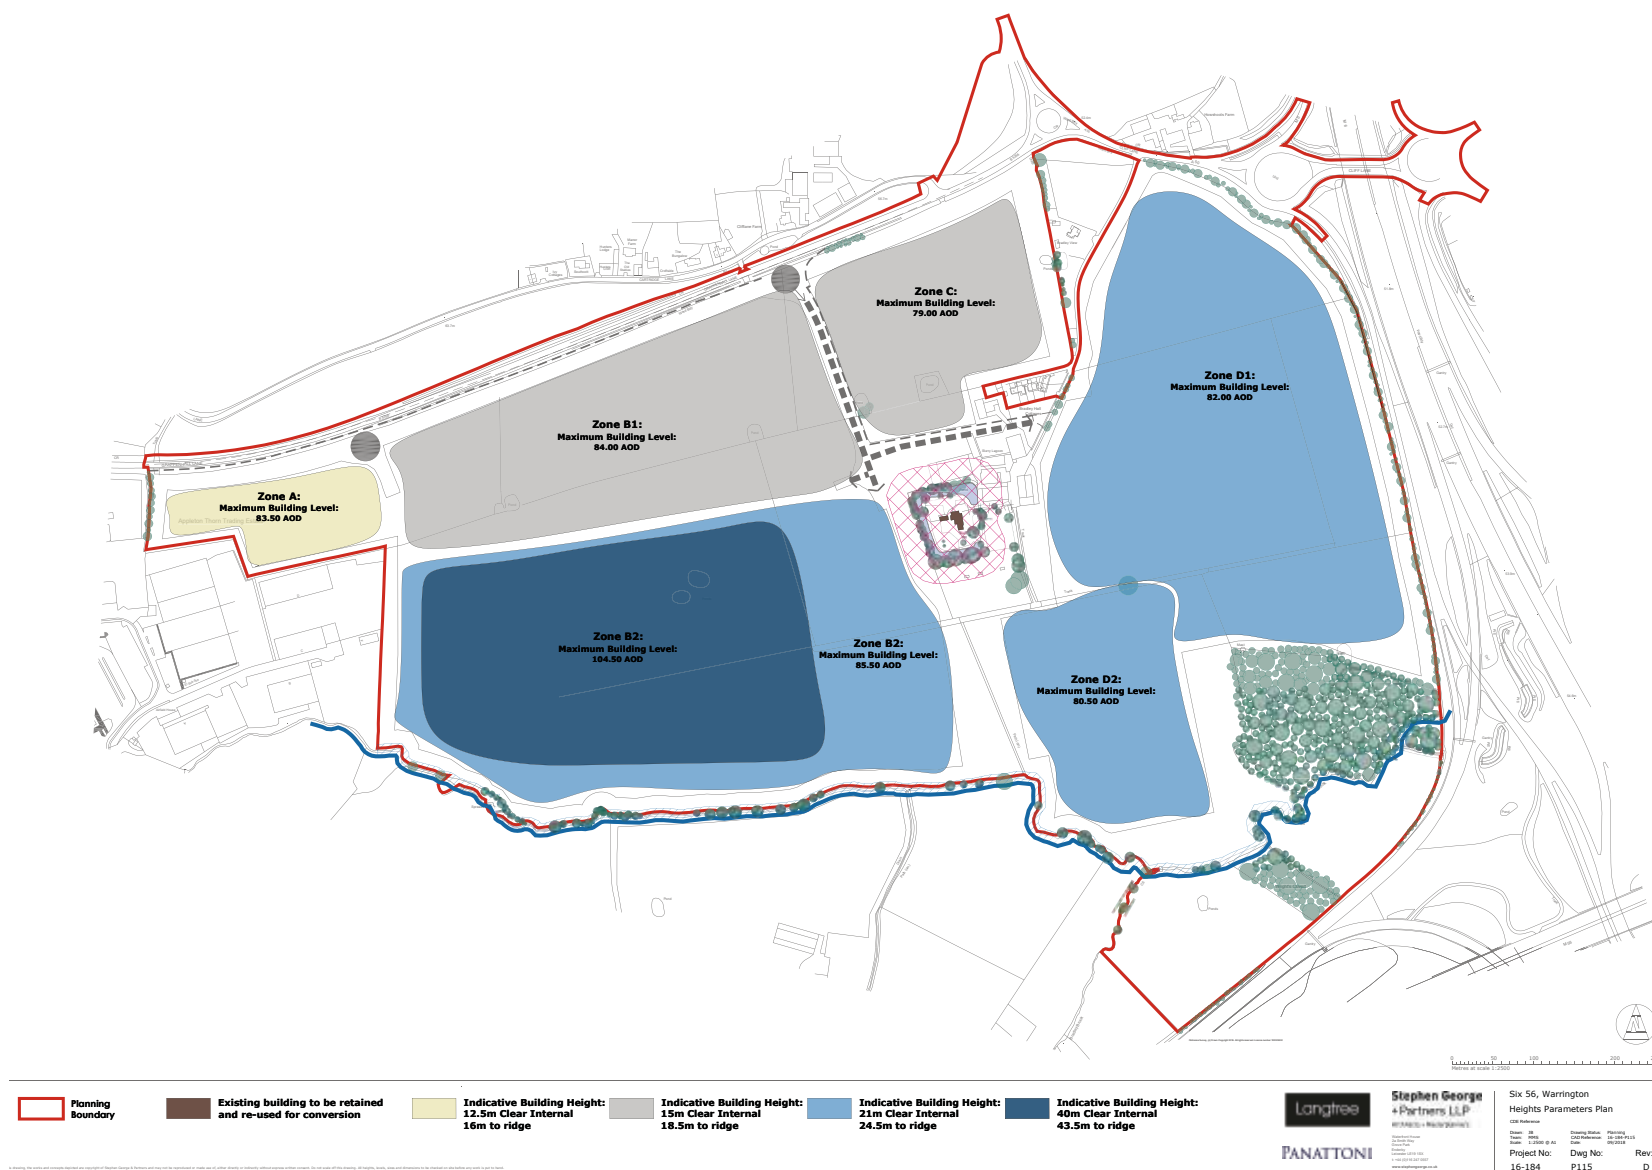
BUILDING HEIGHTS PARAMETERS PLAN
